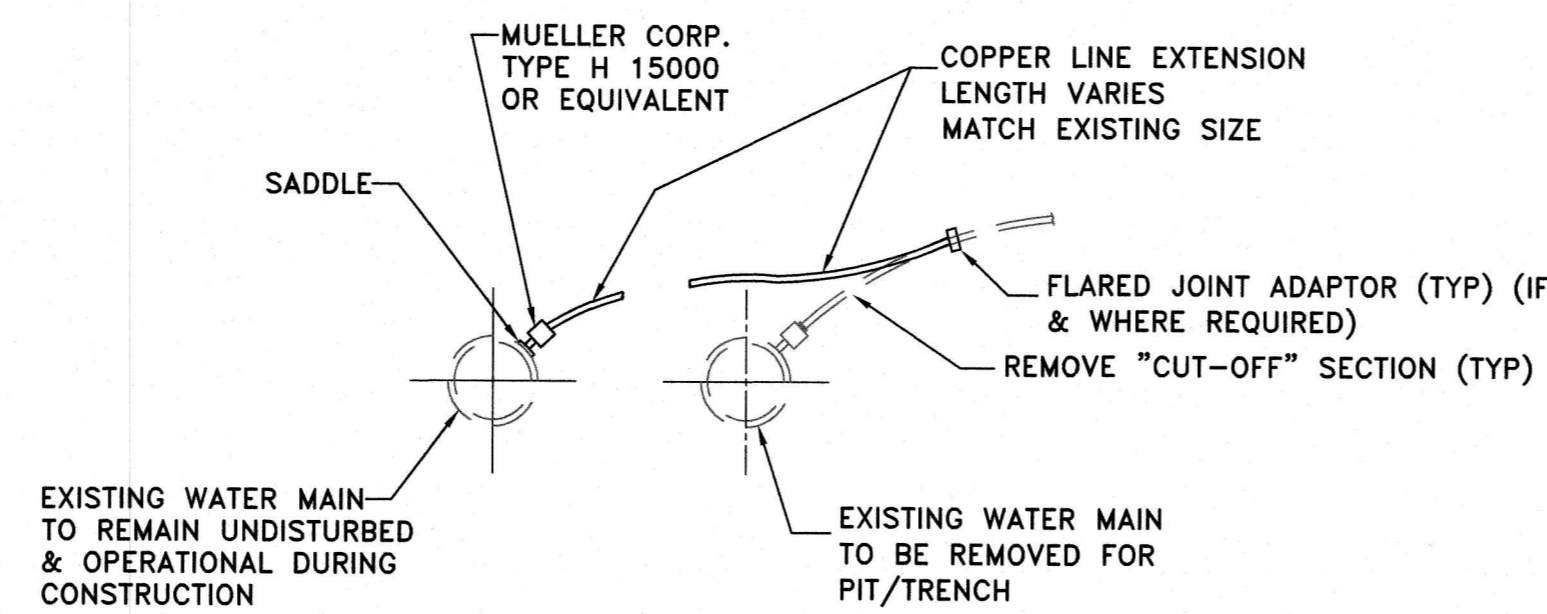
PIPE CROSSING AT POINTS OF INTERFERENCE
